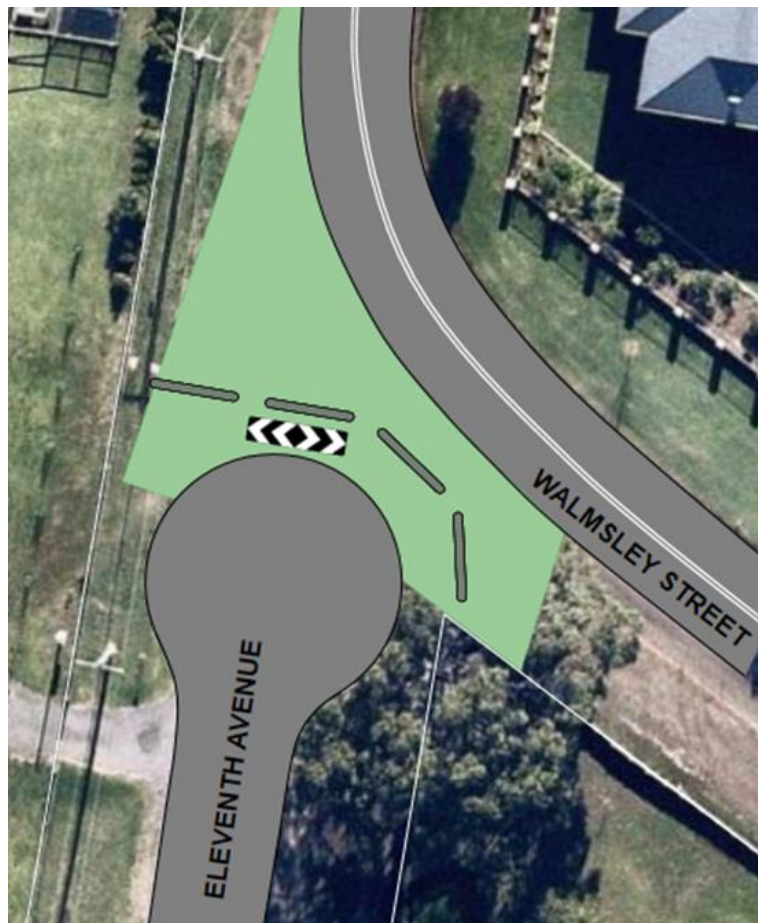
Eleventh Avenue and Walmsley Street - Intersection Treatment
